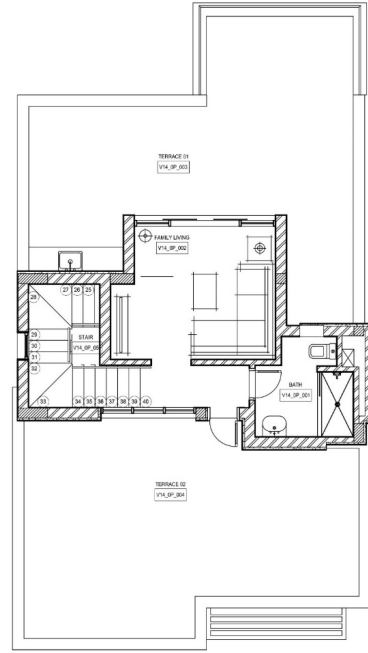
Pent House Roof Plan of Villa Type 14 (Emmar Misr for Development, SAE, 2019)
